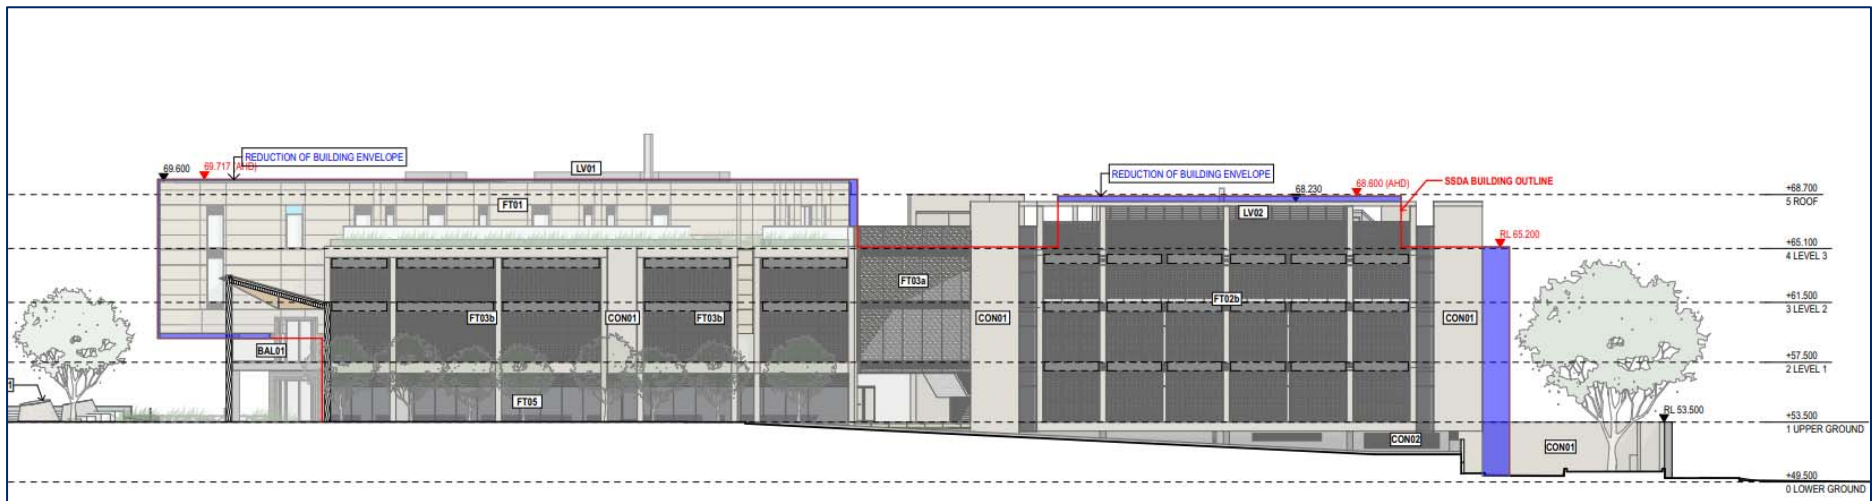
| Western elevation – Stages 1A and 1B complete (Source: Applicant's SRtS)
